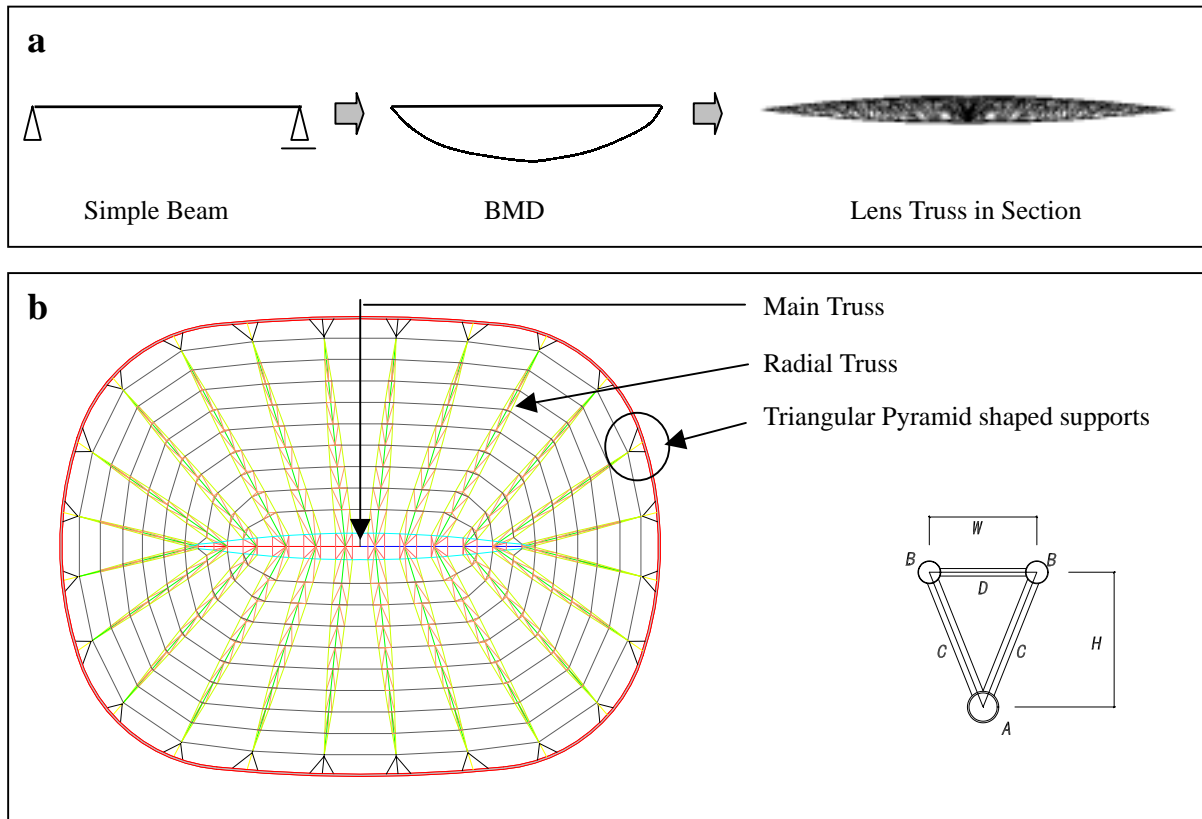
a) Structural roof system concept, b) roof plan and section shape
